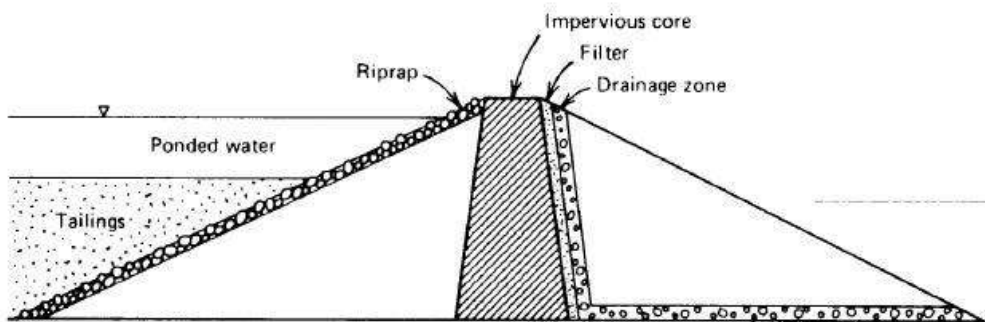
Schematic cross-section of a tailings dam (VICK, 1990).
